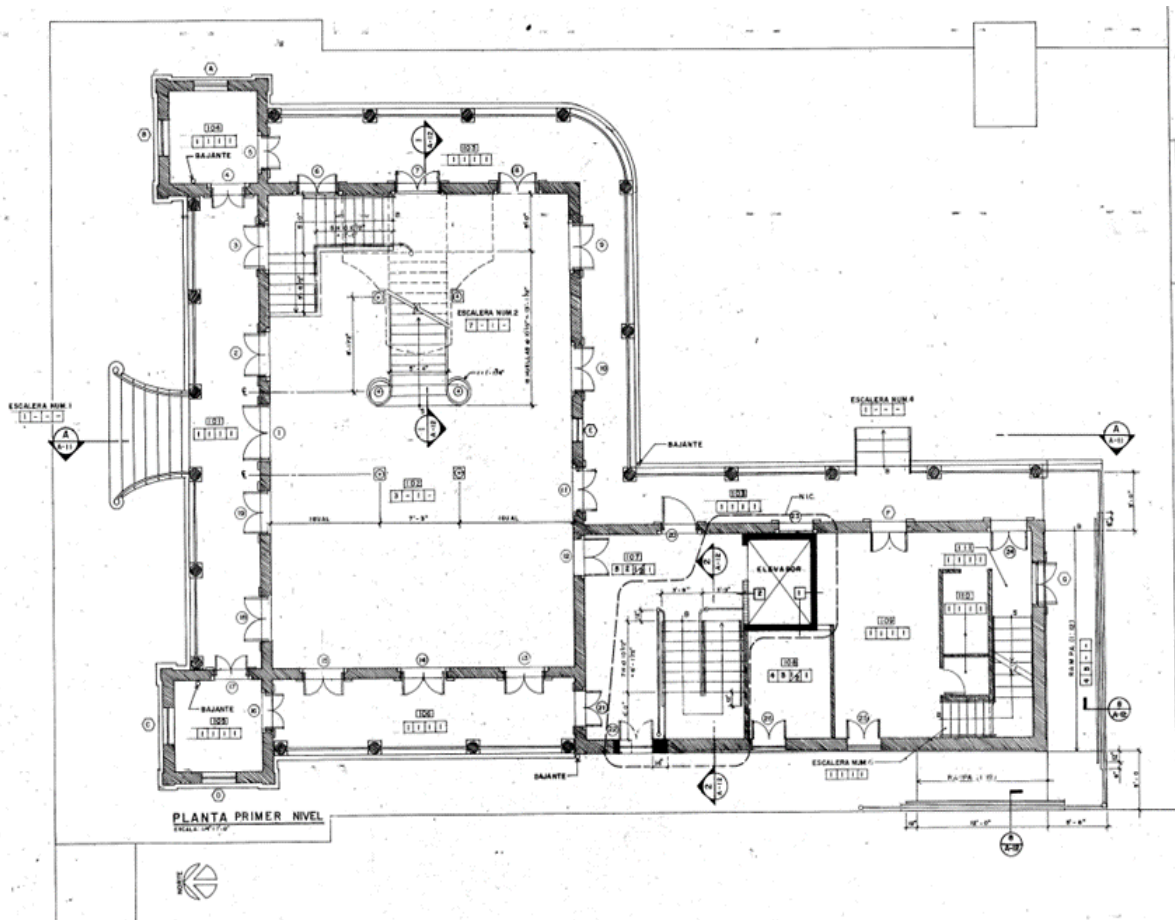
First floor drawing for the reconstruction of the Iruena's manor house.
